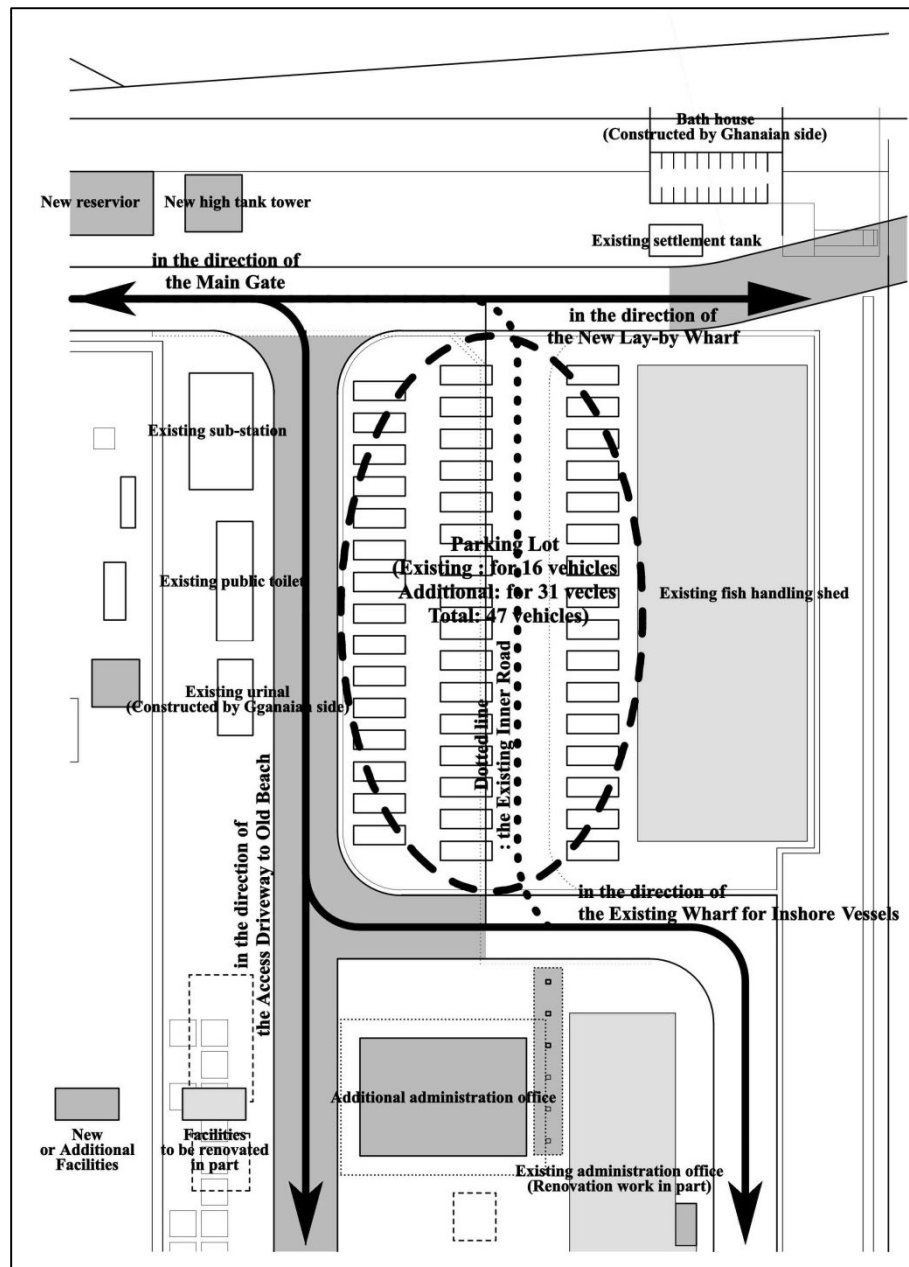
(2) Layout Plan of Parking Lot, Pavement and Detour Roads
